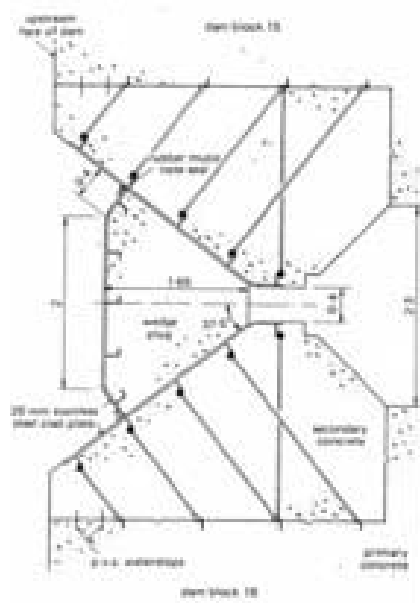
Details of the wedge plug of Clyde dam slip joint
